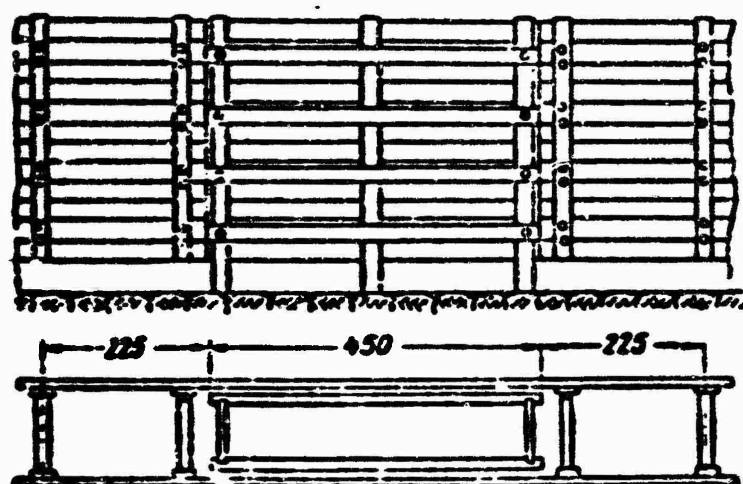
Frame bracing of a trench at the point at which pipes are lowered.
